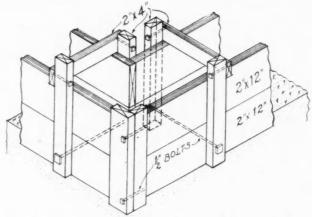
A Section of Wall Form for Use on Work Where a Small Crew is Employed.
